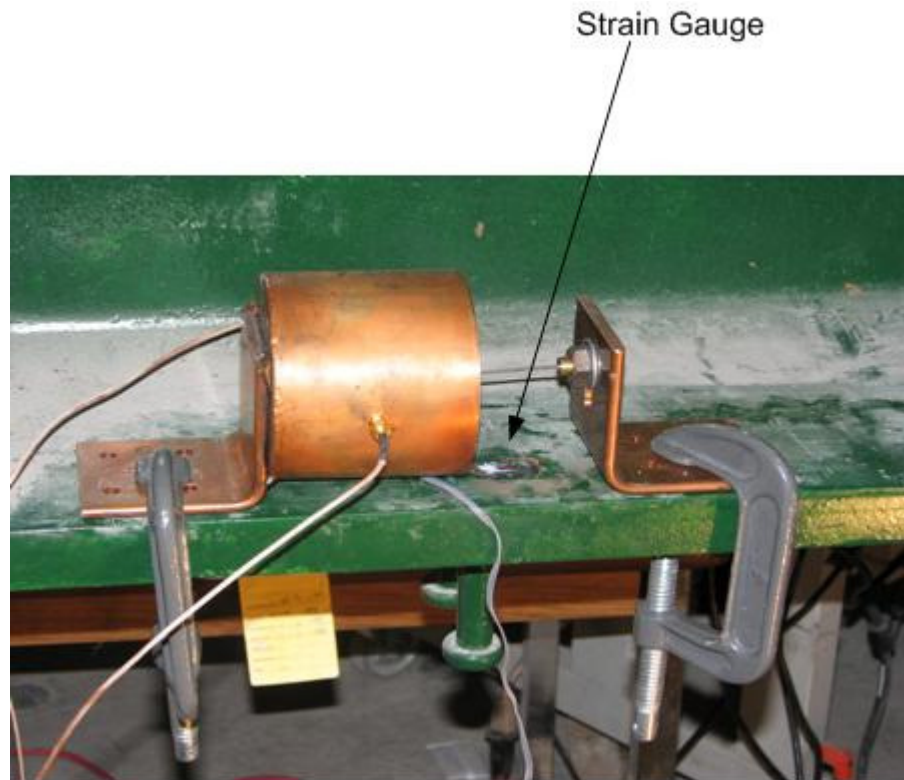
Diaphragm Sensor Mounted on the Bridge Girder
